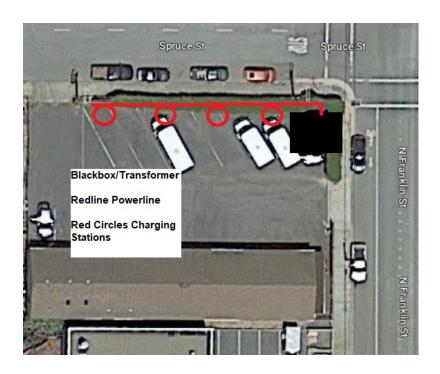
Current Plan for Installation of Charing Equipment Ukiah
